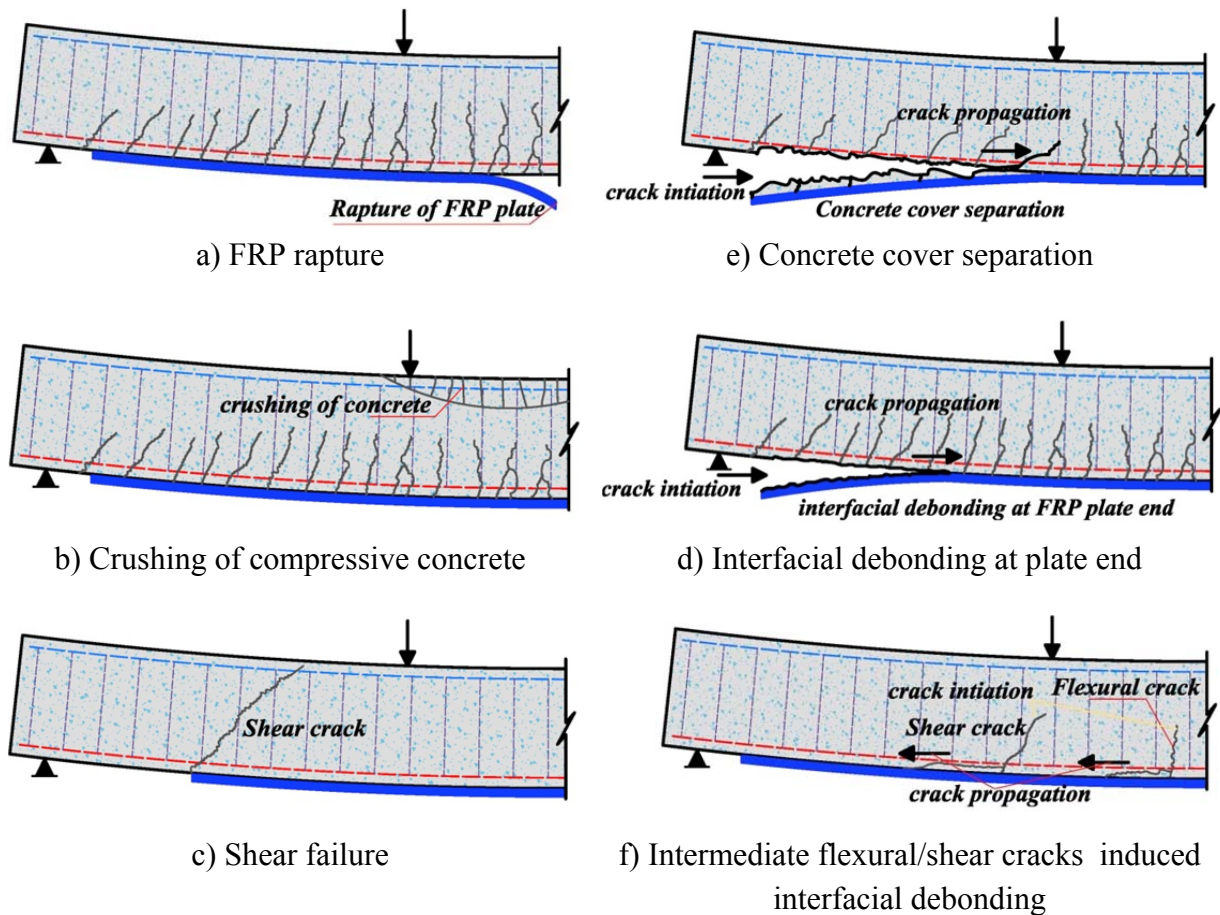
Failure modes in reinforced concrete beams strengthened with FRPs
